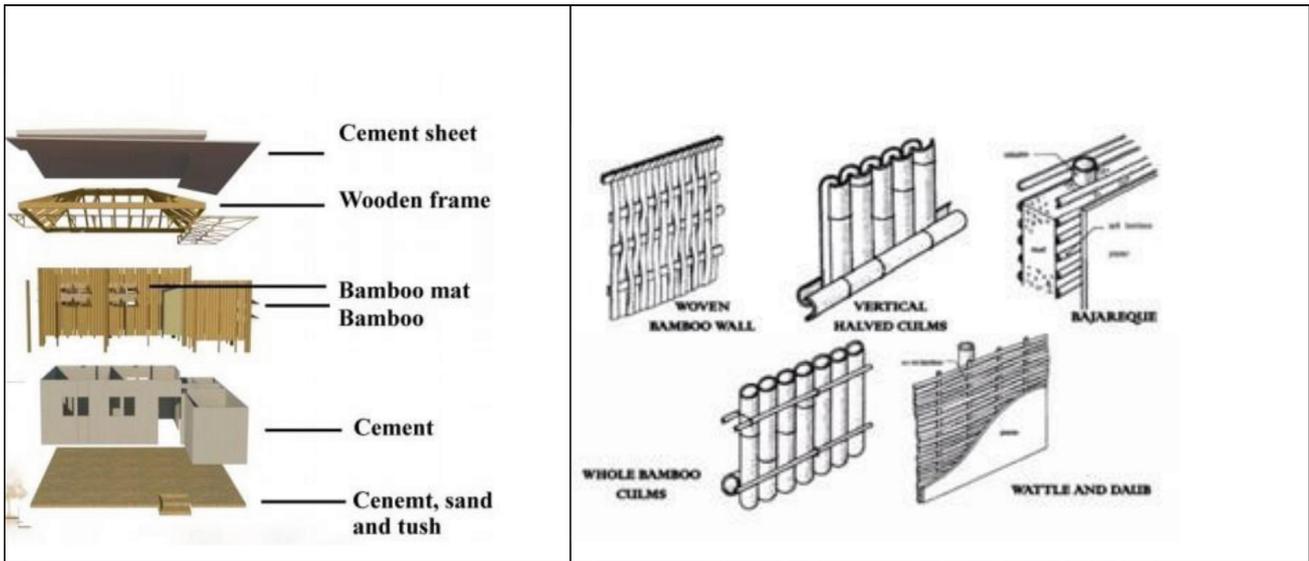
Exploded Axonometric of Wall–Roof Assembly Using Bamboo and Cement (left); Traditional Bamboo Construction Techniques and Joinery Variants (right)
